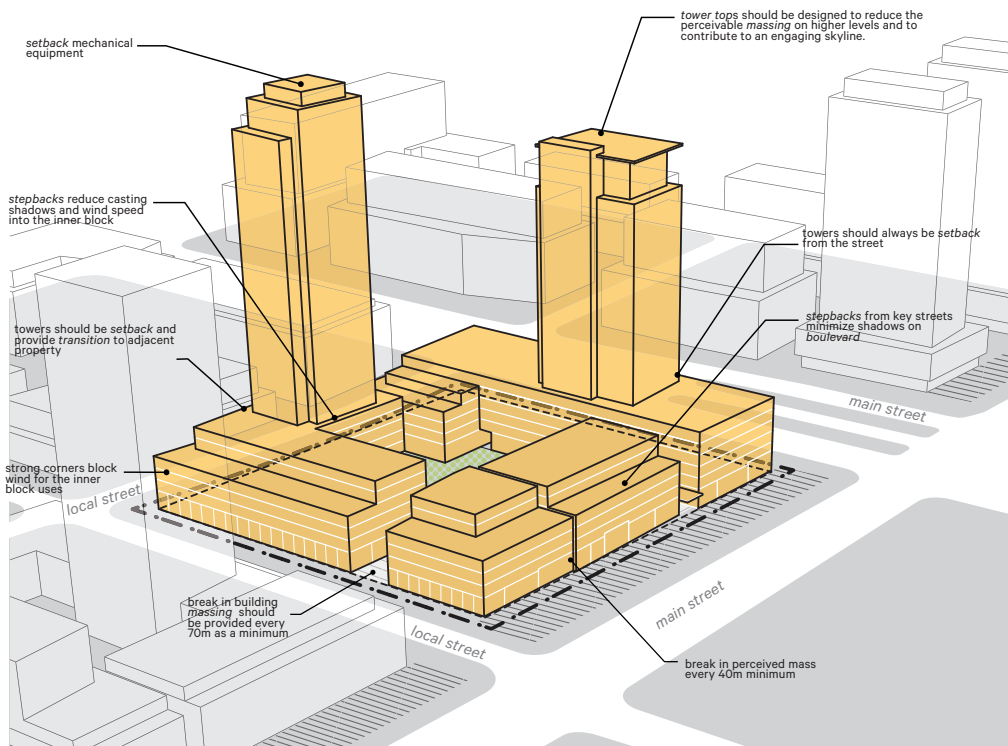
Example of a Block Plan design, City of Hamilton's Tall Building Guidelines (2018), Section 4, Page 70.
